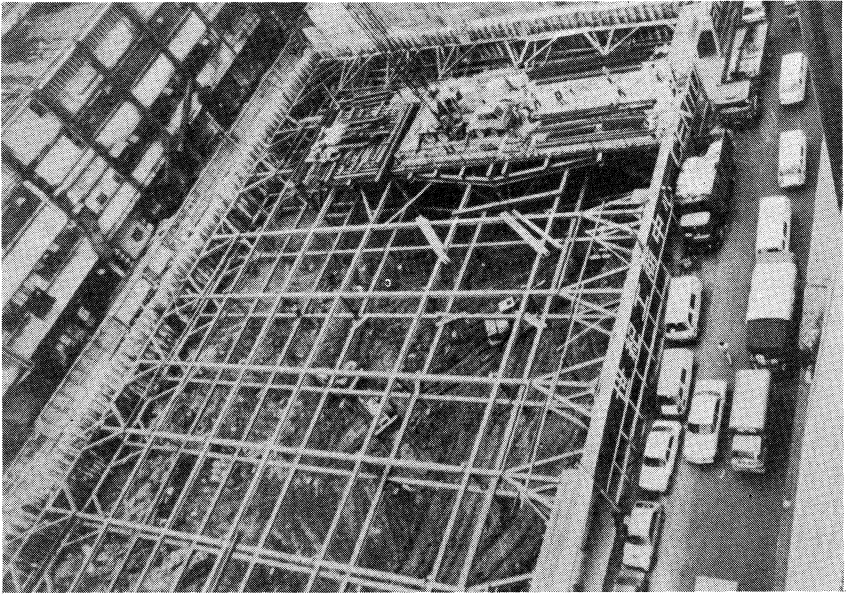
Typical Arrangement of a Shoring System for Deep Basement Excavation in Hong Kong.
